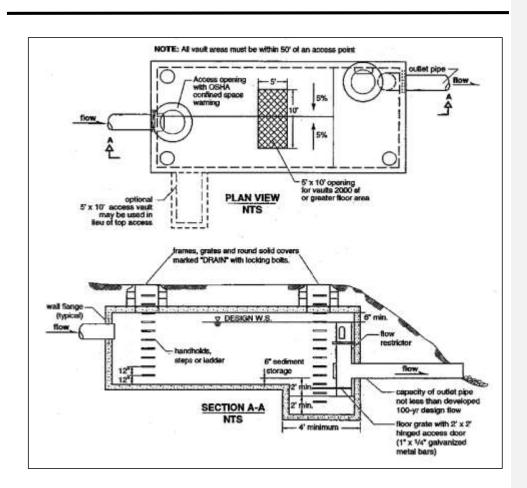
Schematic of Typical Underground Detention Vault (Source: WDE, 2000)
